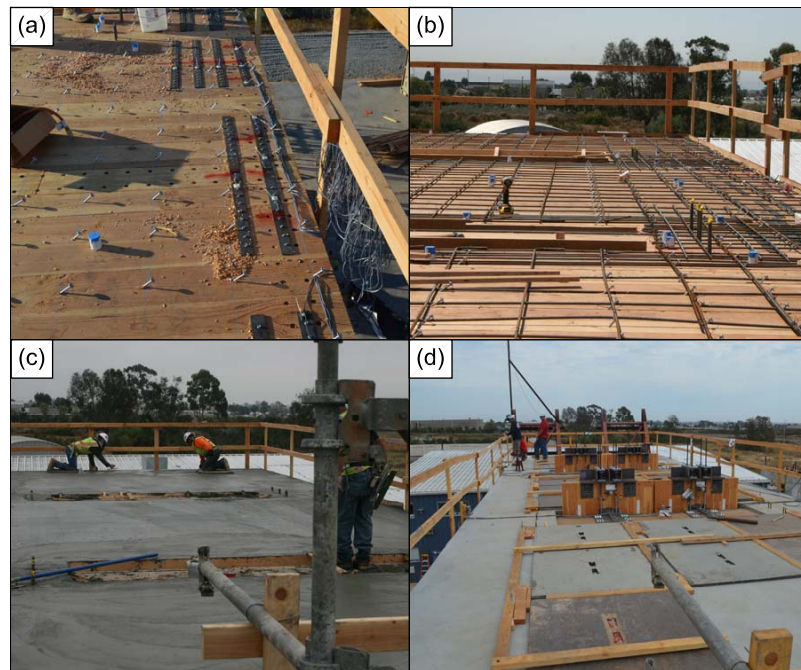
Concrete composite deck construction sequence (a) shear studs and diaphragm splines and ties (b) rebar (c) concrete pour (d) finalized deck with seismic mass
